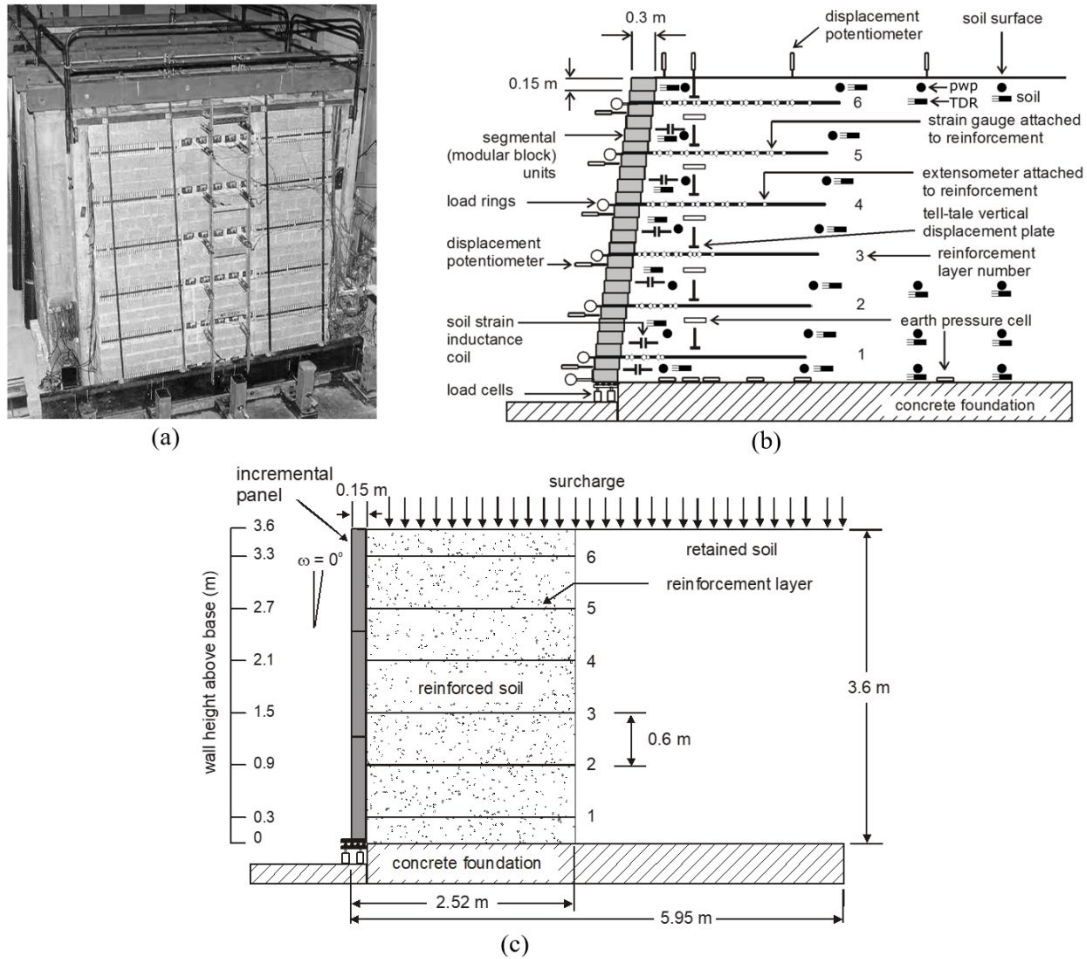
a) Photograph of RMC Full-Scale Soil Structures Test Facility; b) typical instrumentation layout for full-scale MSE wall tests; and c) full-scale MSE wall with precast concrete panels.
